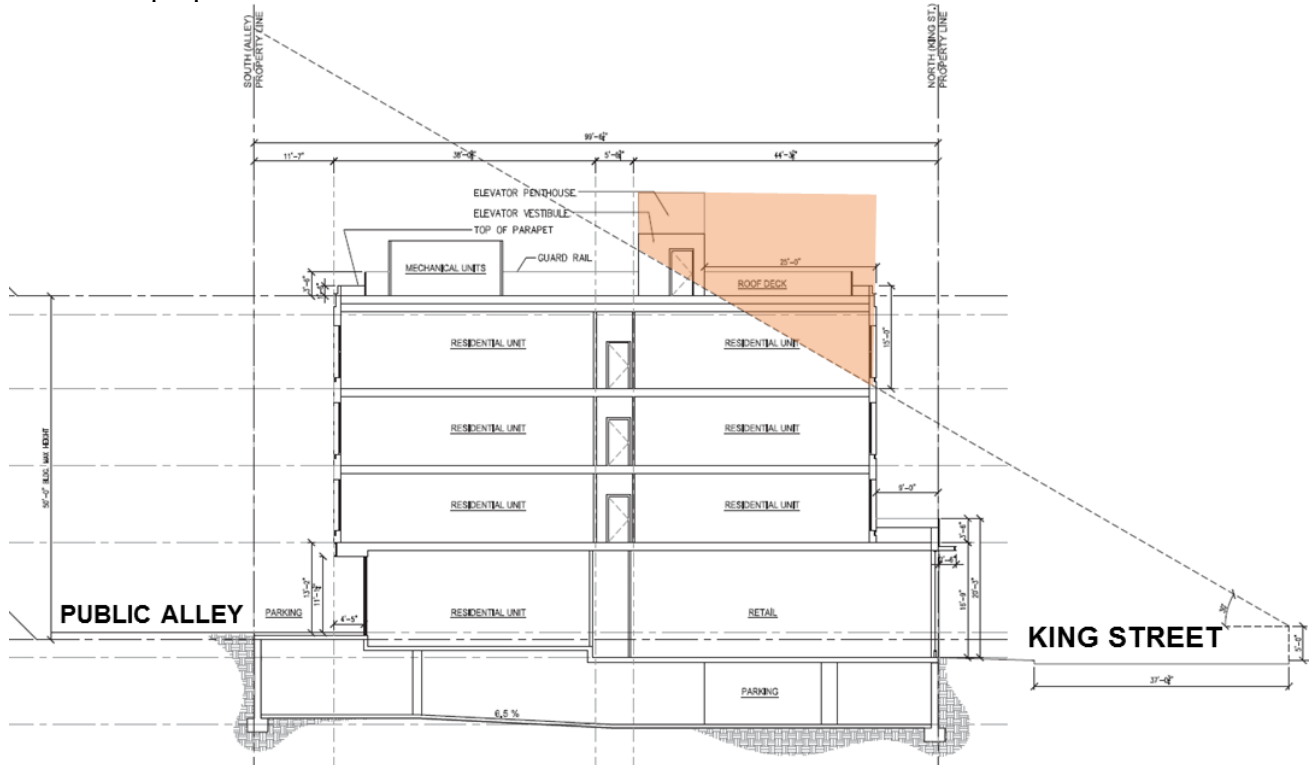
Portion (in orange) of the new building that does not comply with the recommended 30-degree building envelope starting from King Street.
